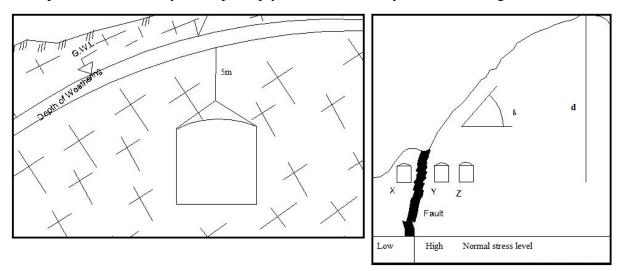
Stress situation for a underground cavern in steep valley with fault zone (right) and minimum rock cover for shallow seated underground openings (left), (Selmer-Olsen and Broch, 1977)
